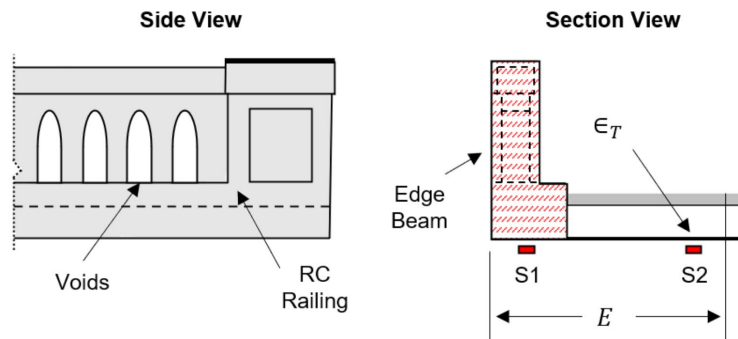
Illustration. Side-view railing detail and cross section considered for calculating K_a .
